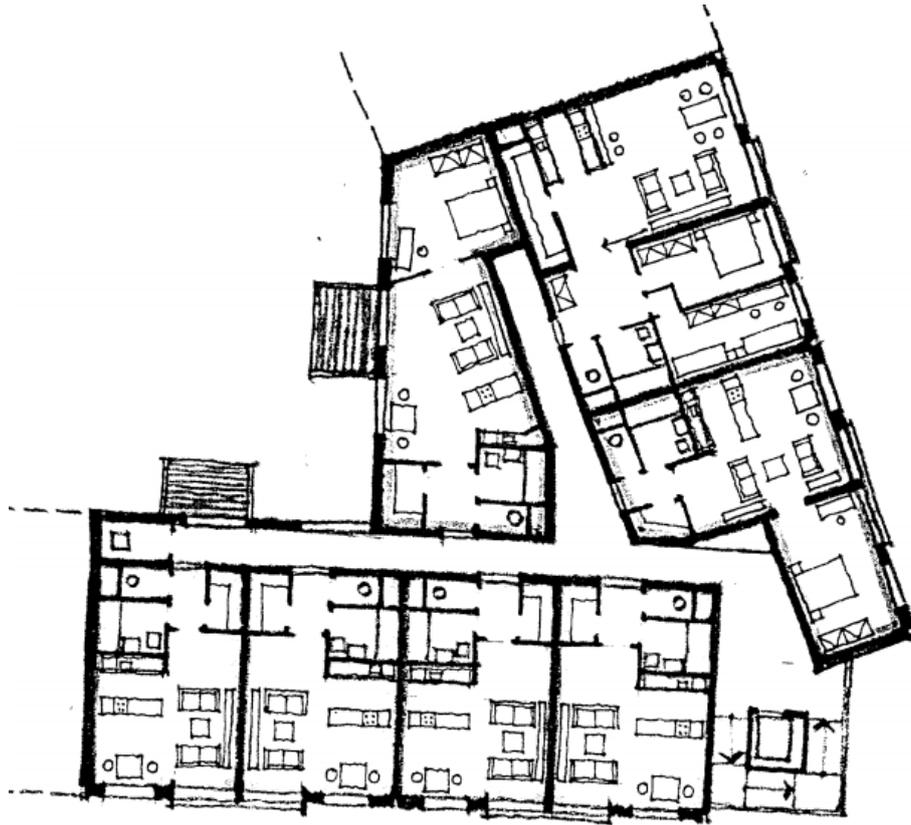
Layout of typical floor for residential strategy (internal database of the investor)
